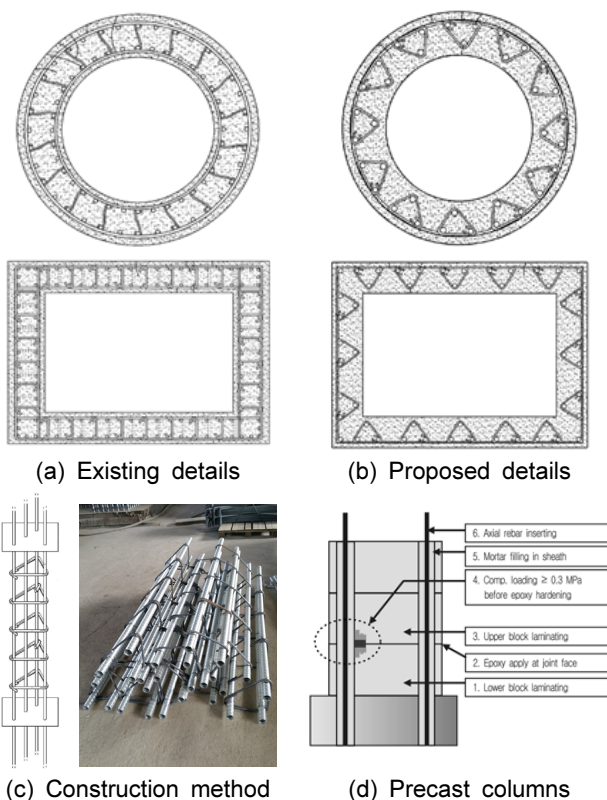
Hollow cast-in-place and precast columns with triangular reinforcement details^{3,4)}
